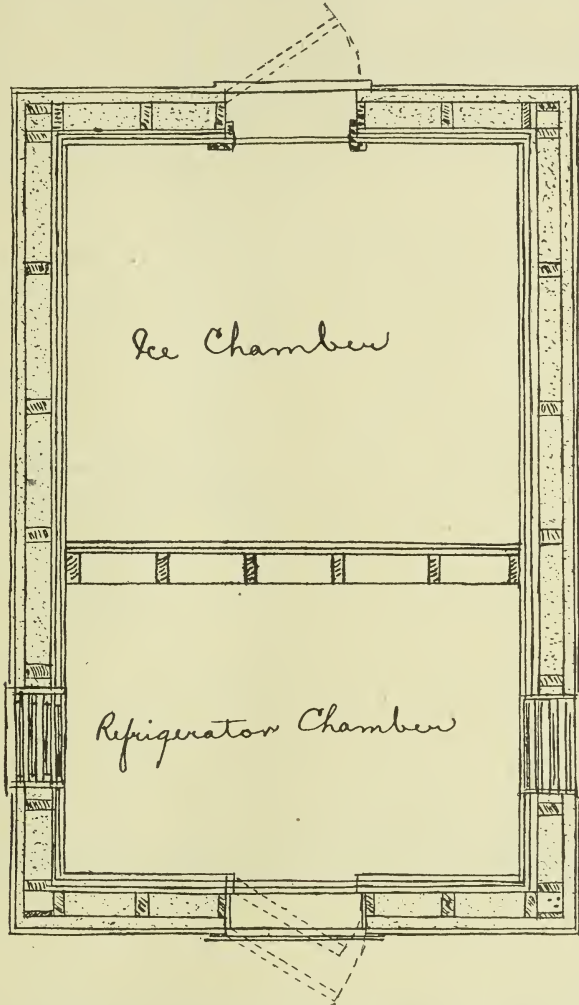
Horizontal plan of Hanrahan's cold storage, showing insulation.
